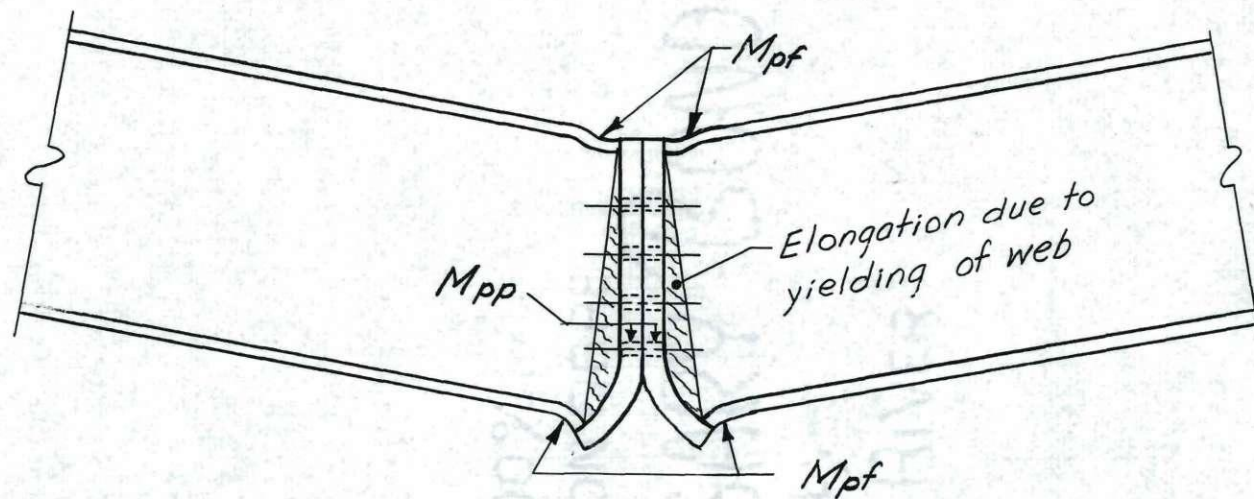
Distortion of Direct Moment Connection and Beam for Practical Case
